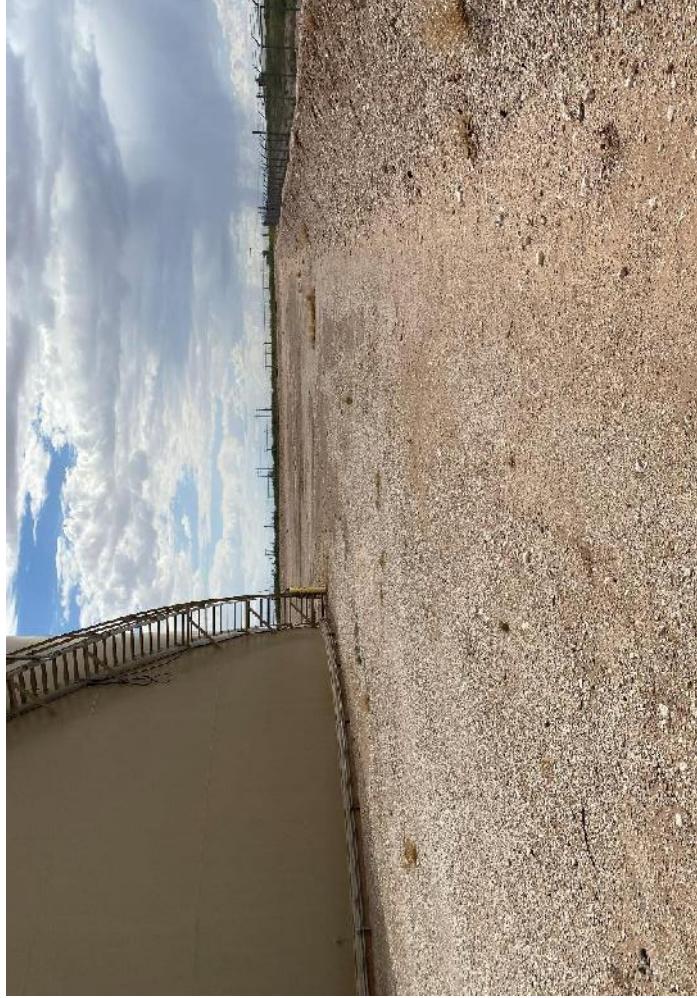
Photograph location 20. August 22, 2024. Central portion of the facility, inside northern berm of former Tank 970 facing east. View of HA-North location and adjacent aboveground pipelines and concrete supports.
